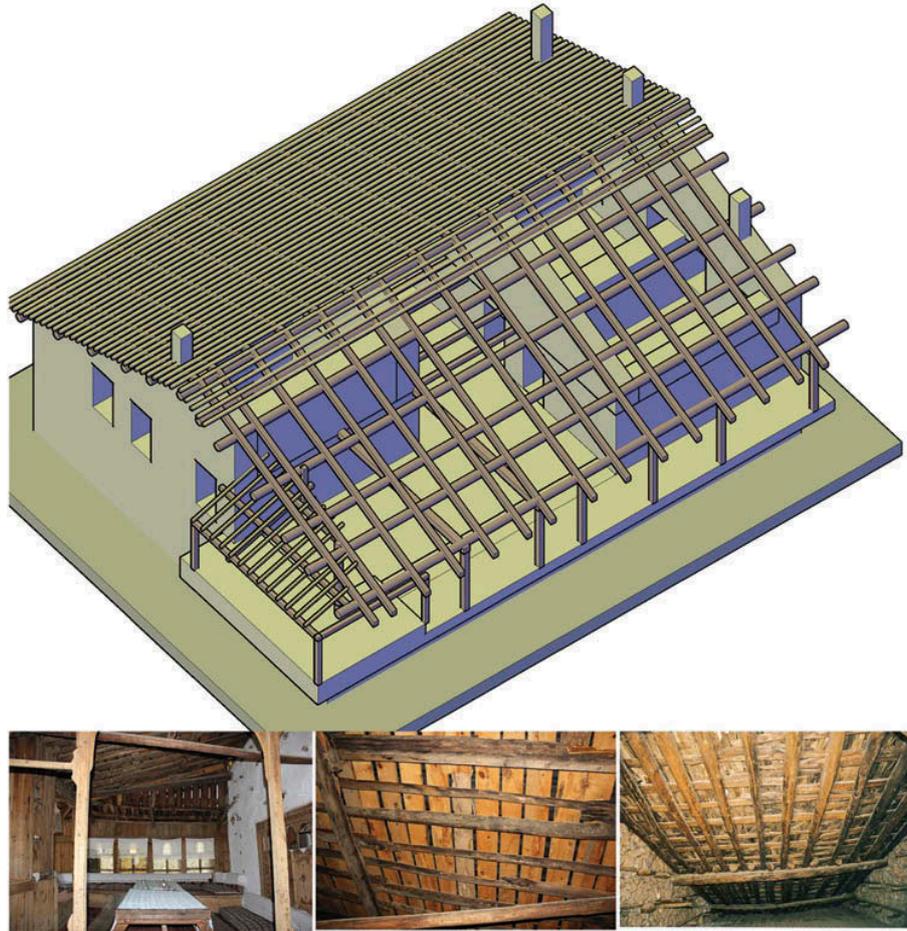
A 3D model and photographs of the roofing system of the Ömer Duruk dwelling in the Bucakalan village.
